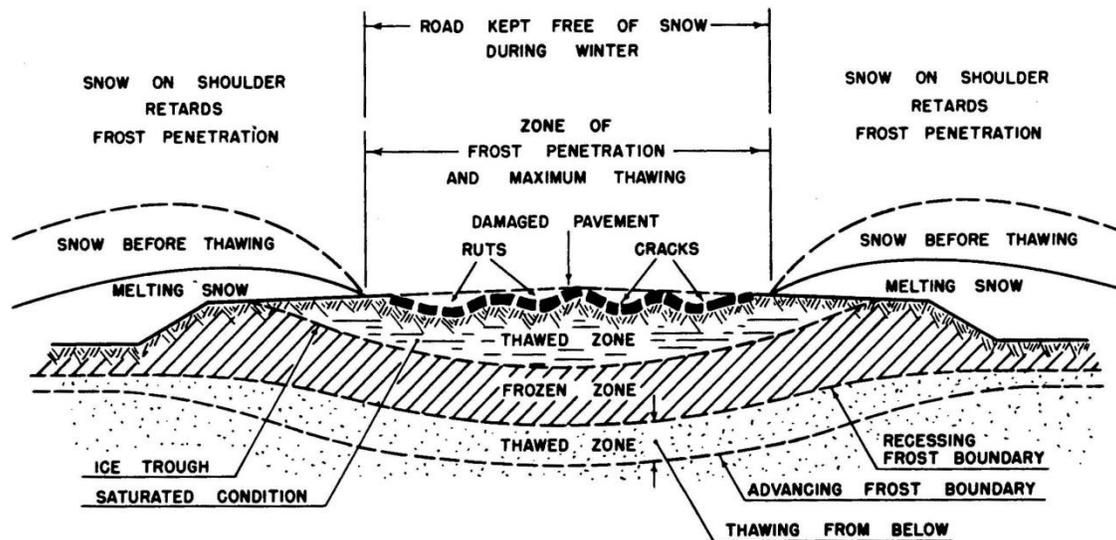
Frozen and Thawed Zones within and below the Pavement Structure
